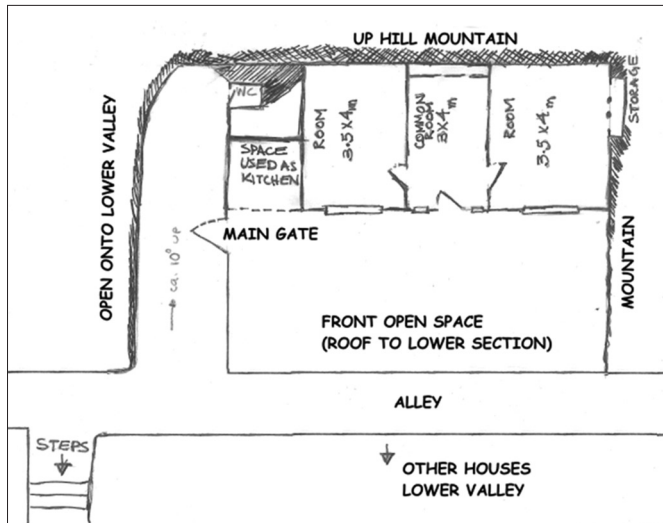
Sketch showing the plan of the main living area in the upper section of the visited house in the town of Tewelle. (Author, 2014)
